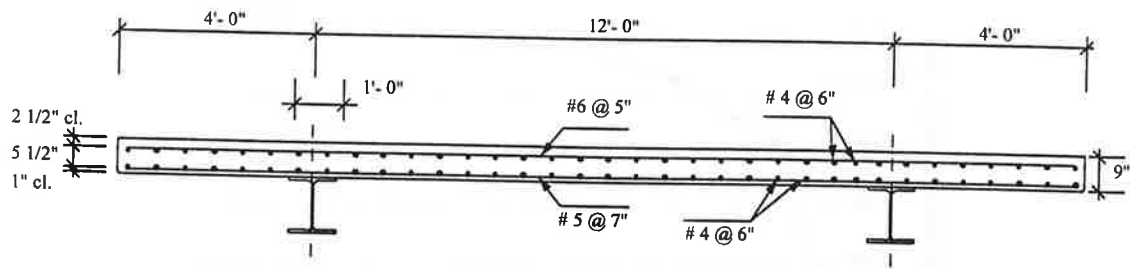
Full-Depth Cast-in-Place Deck System with Conventional Reinforcement
